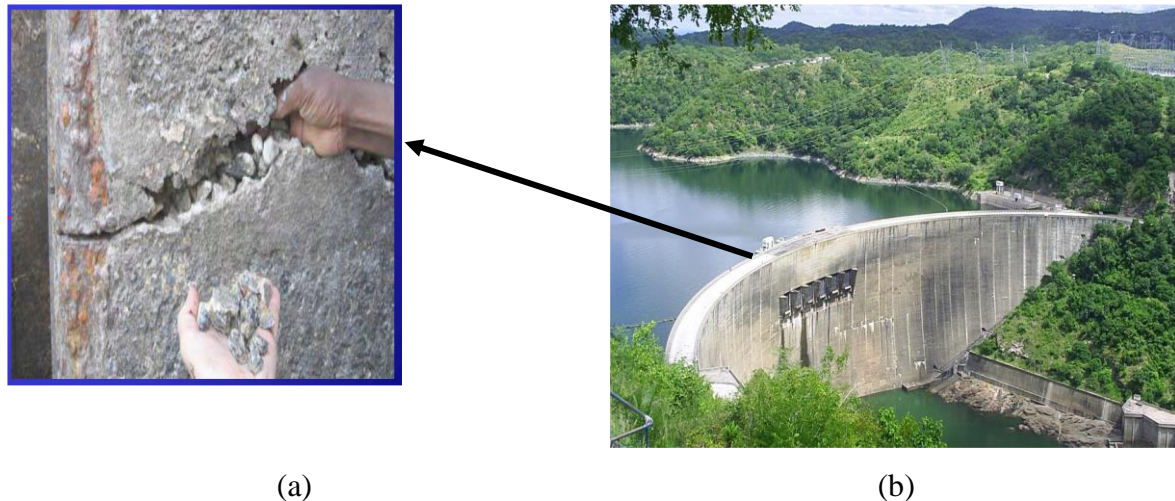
Kariba double arch dam in the border of Zambia and Zimbabwe affected by ASR, a) damage and concrete spalling in upstream wall of the dam, b) perspective view of the dam (Mhalanga, 2014).
